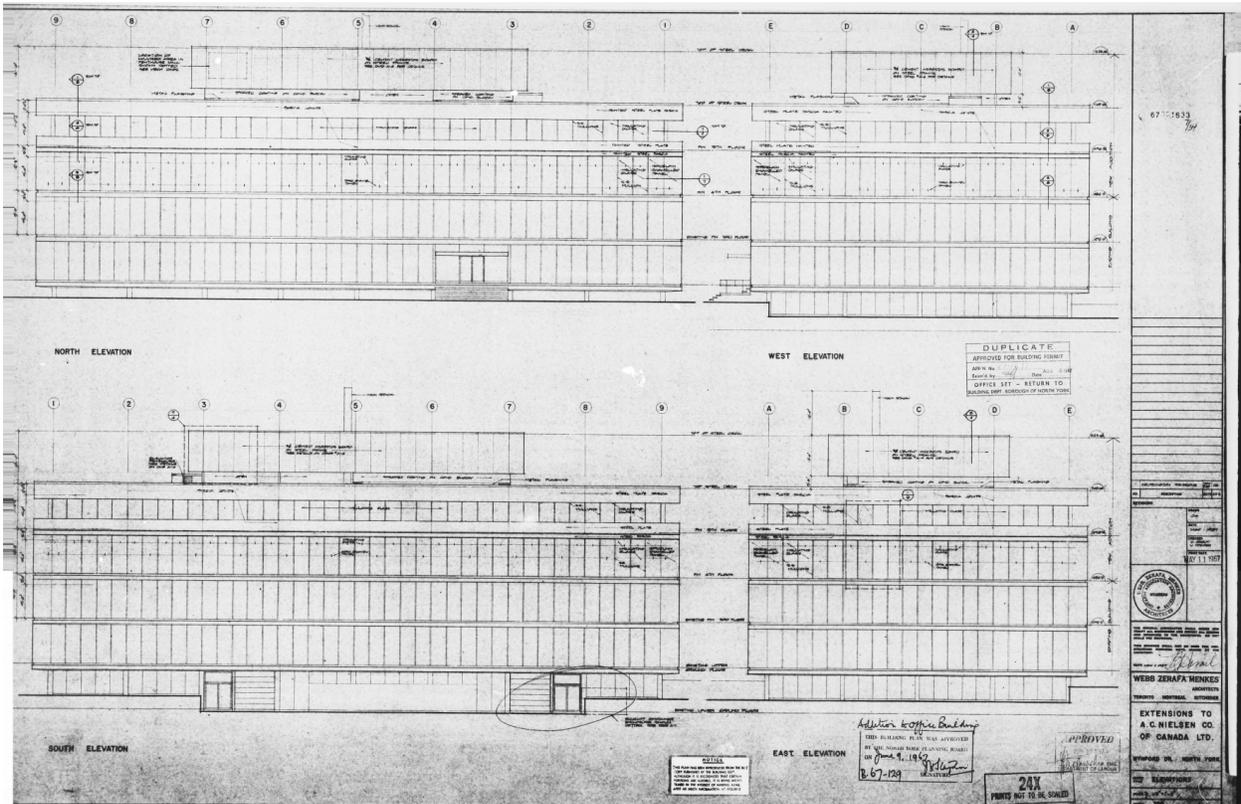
1967 architectural drawings showing 2-storey addition by Webb, Zerafa, Menkes Architects (Toronto Building Records).
